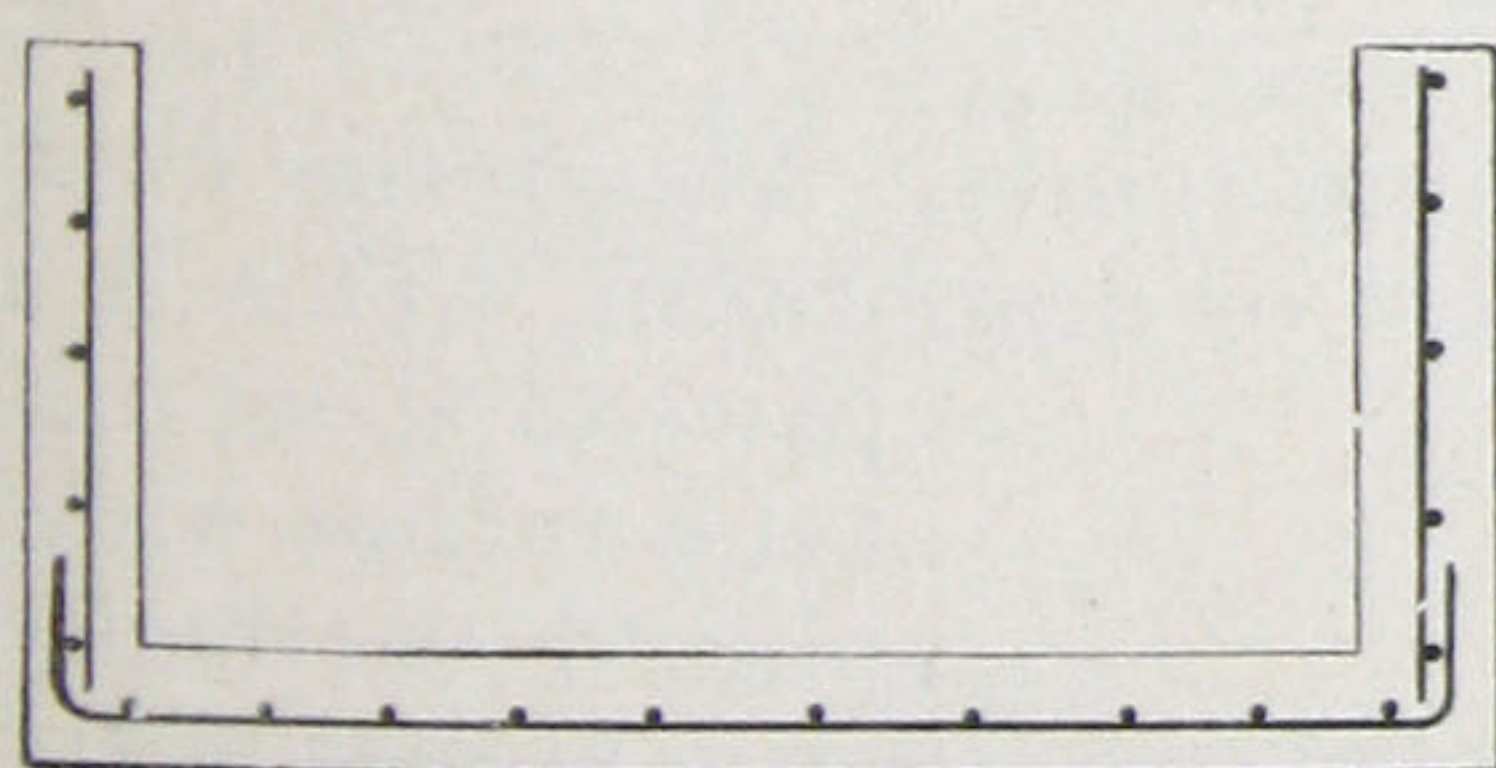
Example of placing steel reinforcing in rectangular tank. Notice how bars are bent up from floor into walls, and also around corners.
